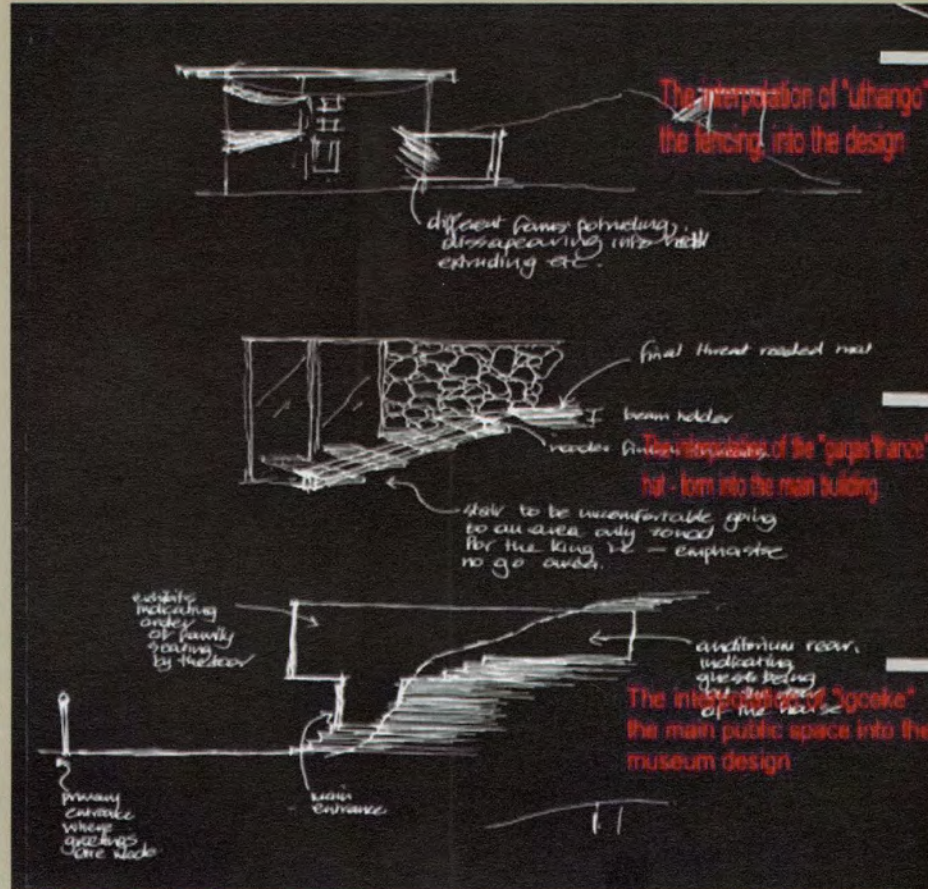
precedent detail Figure 64 exploration sketches of building construction elements
